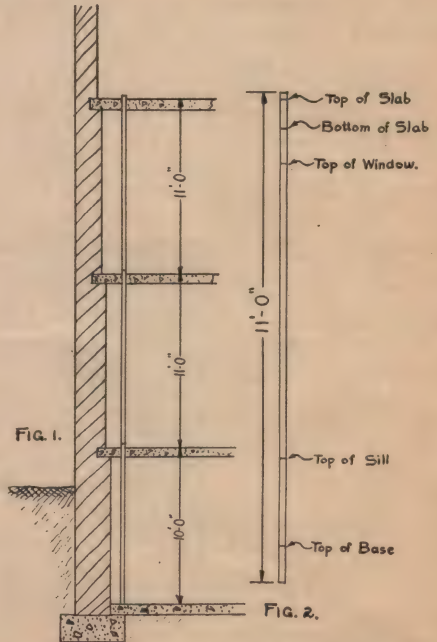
shows the elevation pole with the various points marked on it. Beginning at the bottom and working up, we have: Top of base, top of sill, top of window, bottom of slab and top of slab.
